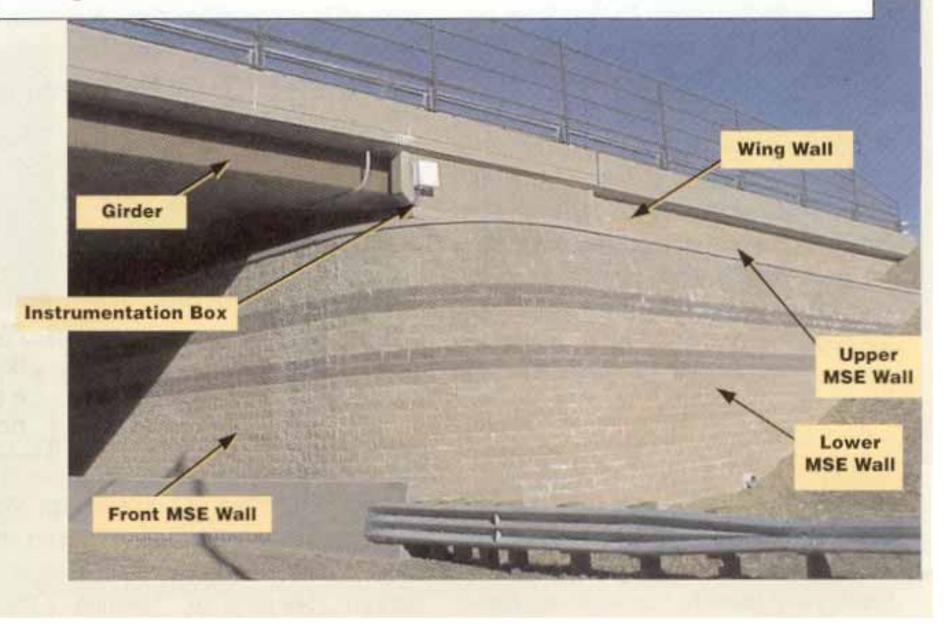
Segmental retaining wall (SRW) components of a completed bridge abutment.
